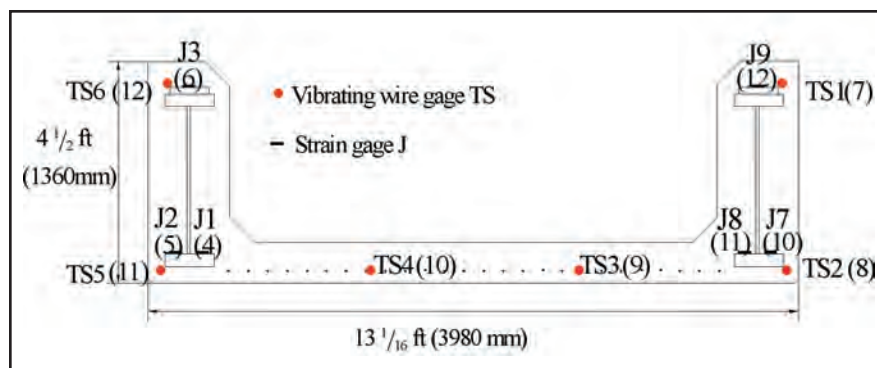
Cross section of instrumented bridge deck with Gauges TS1 and J1 located at midspan and at one-third span.
